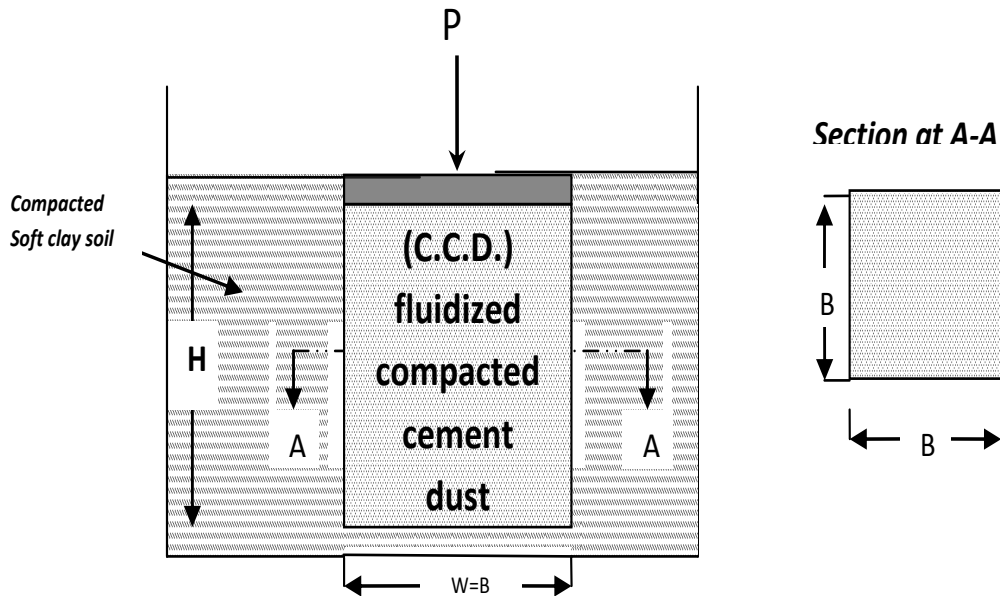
Rectangular footing on C.C.D., note that: width of compacted cement column C.C.D. = W , width of footing = B , $W=B$
